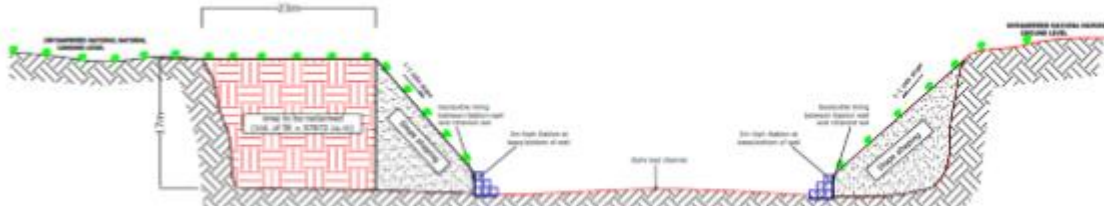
Typical configuration of slope stabilization with gabion retaining walls (Iguosa FHA Engineering Design, December 2019)
